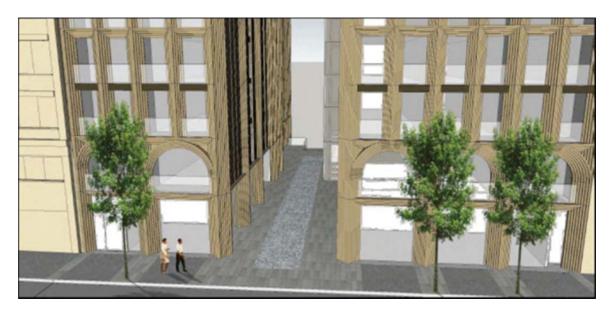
View of proposed through-site link connecting Clarence Street with Kent Street.
